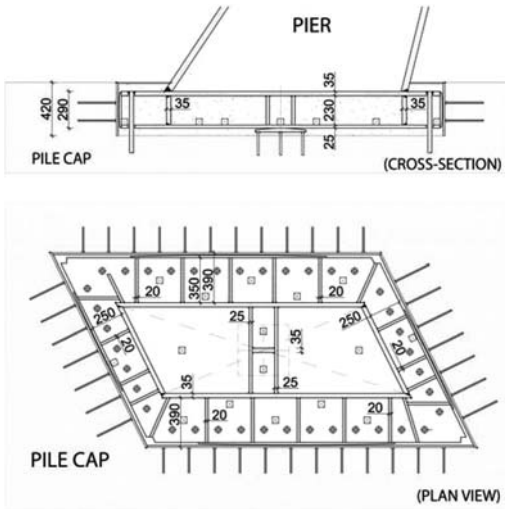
Cross-section and plan view of the pinned-fixed connection element at the base of the piers.
